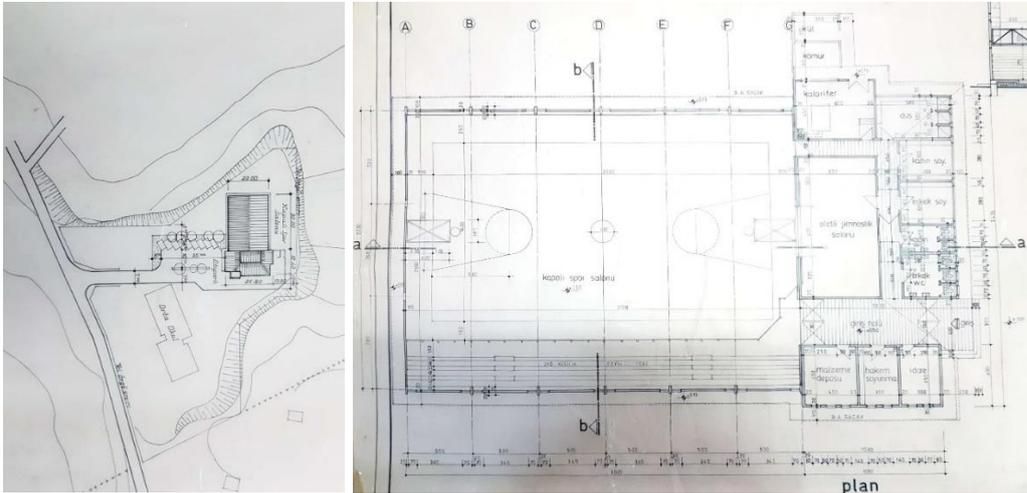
The site plan and plan of the sports hall (Source: TTK Archive, 2020)
